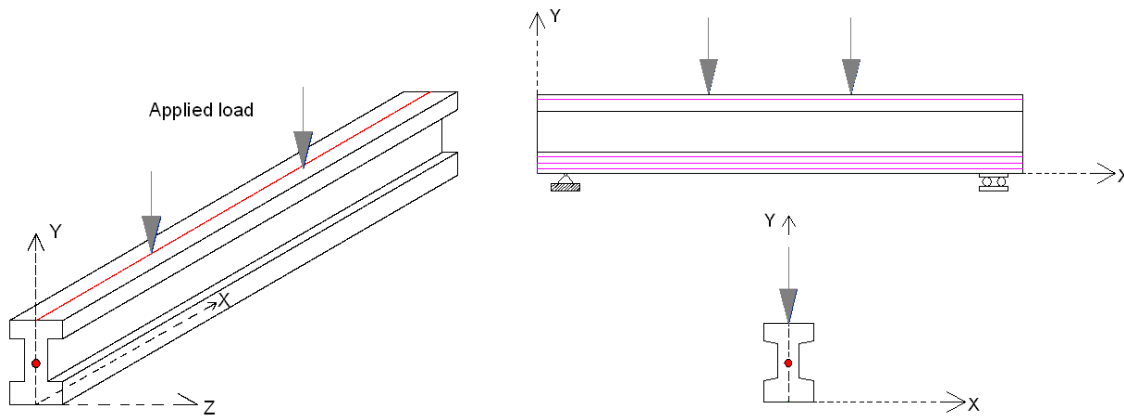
Overview of the prestressed UHPC beam considered for flexural loading
